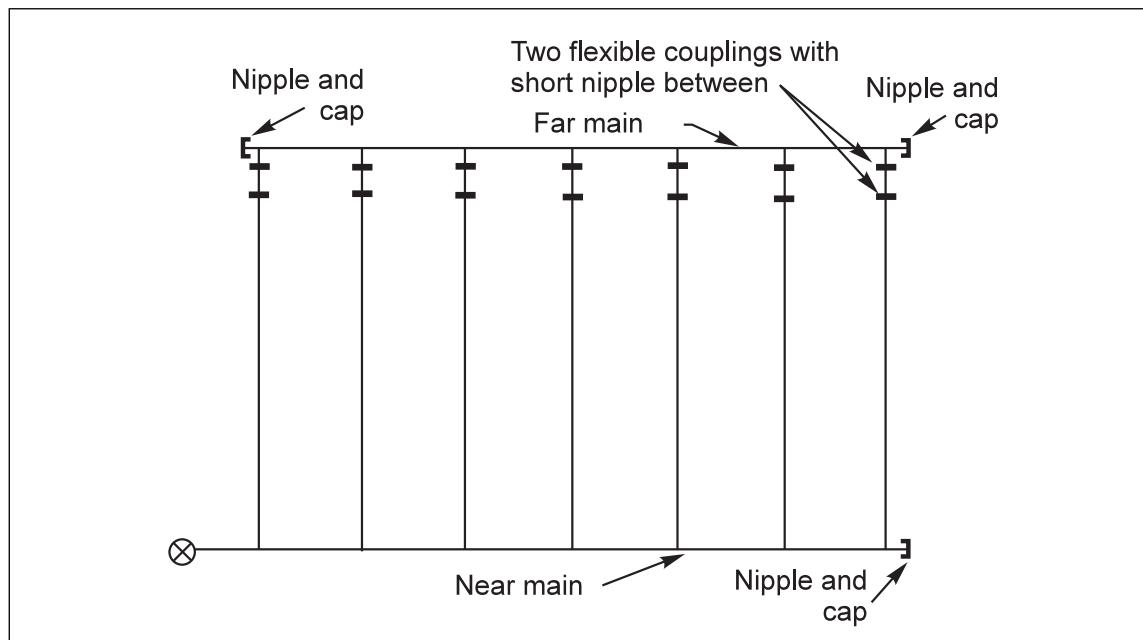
An example of arranging grid-type sprinkler systems for flushing
